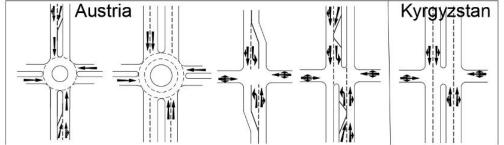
Typical intersection layouts in Austria and Kyrgyzstan
